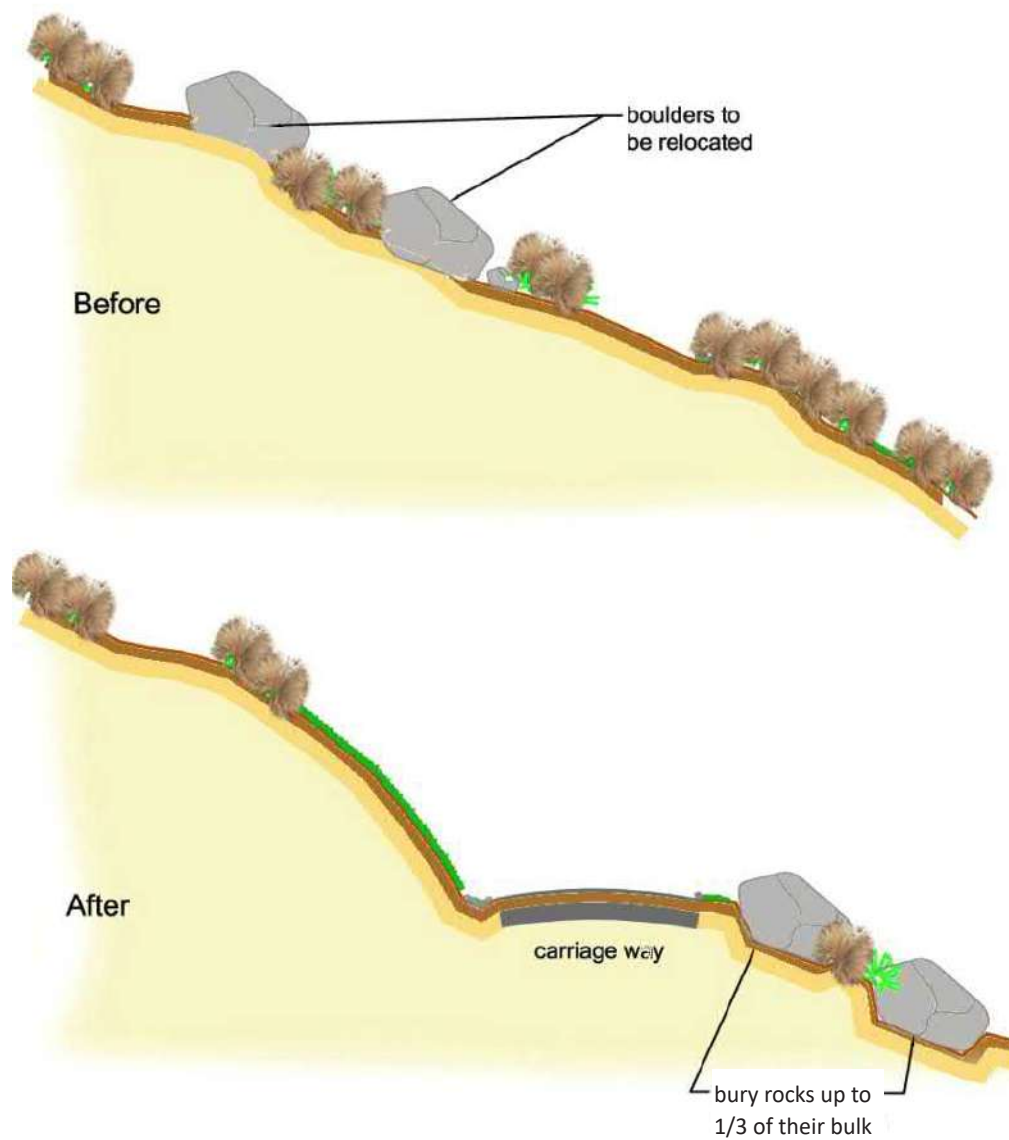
Transfer boulders from uphill of the newly formed access road to below the road.
